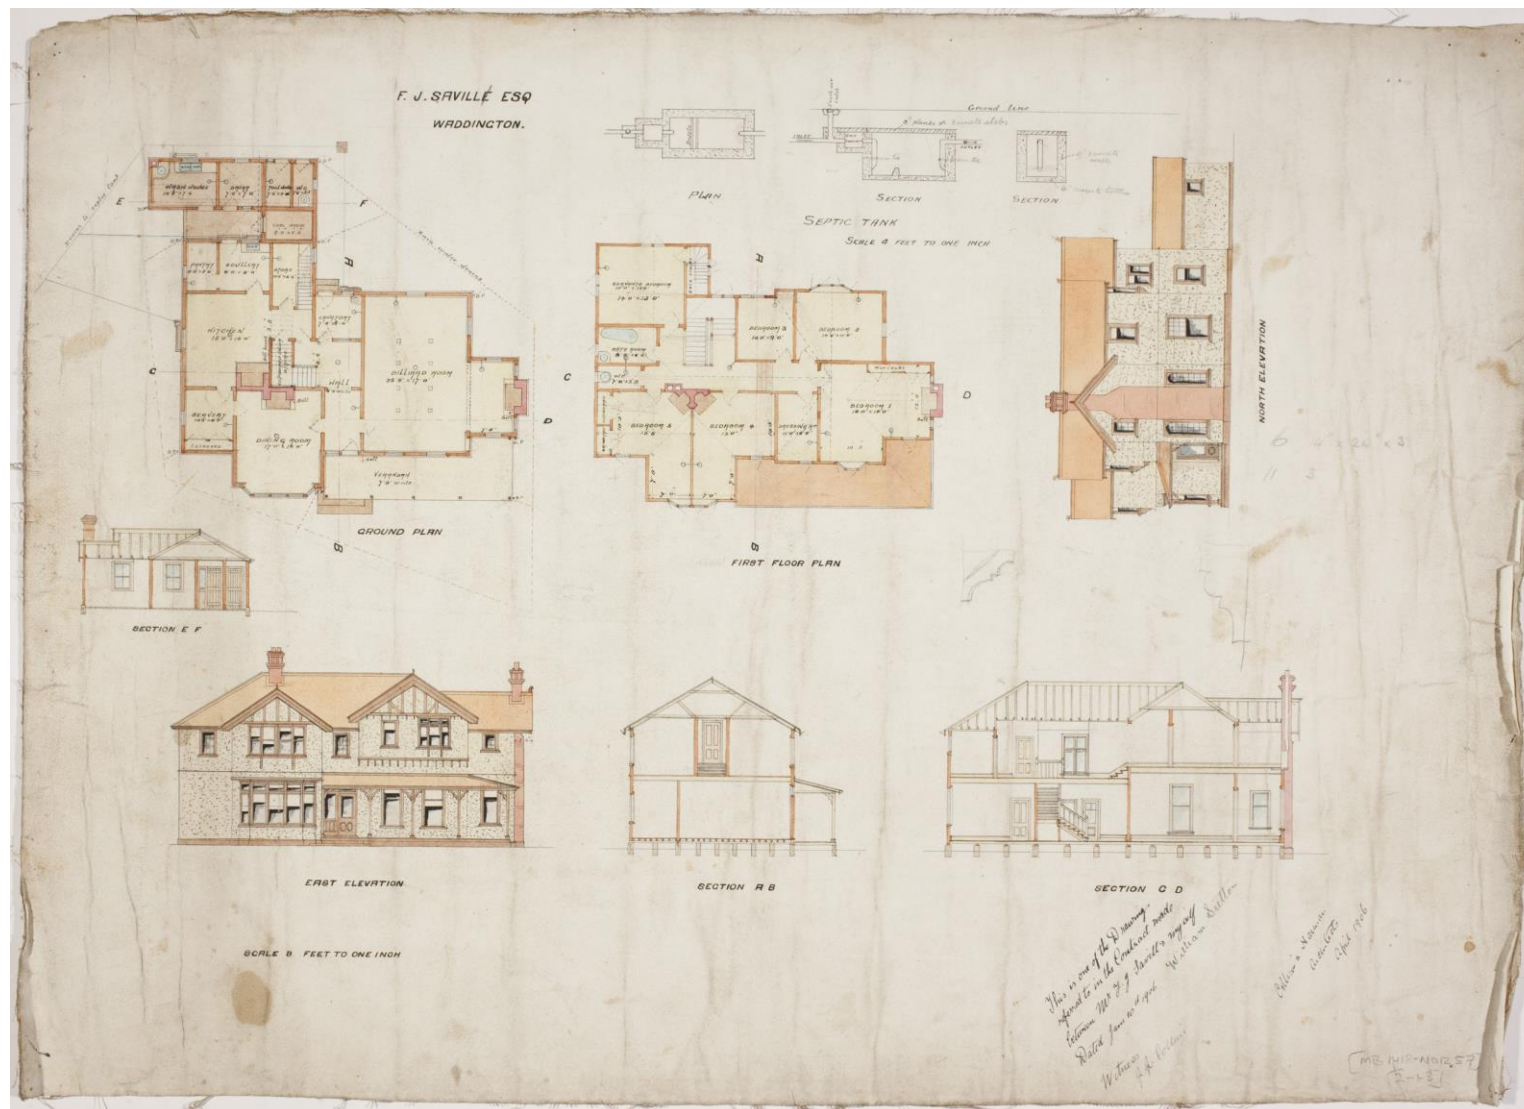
Collins and Harman, F. J. Saville [sic], Esq., Waddington, plans, elevations, sections and details (1906).
